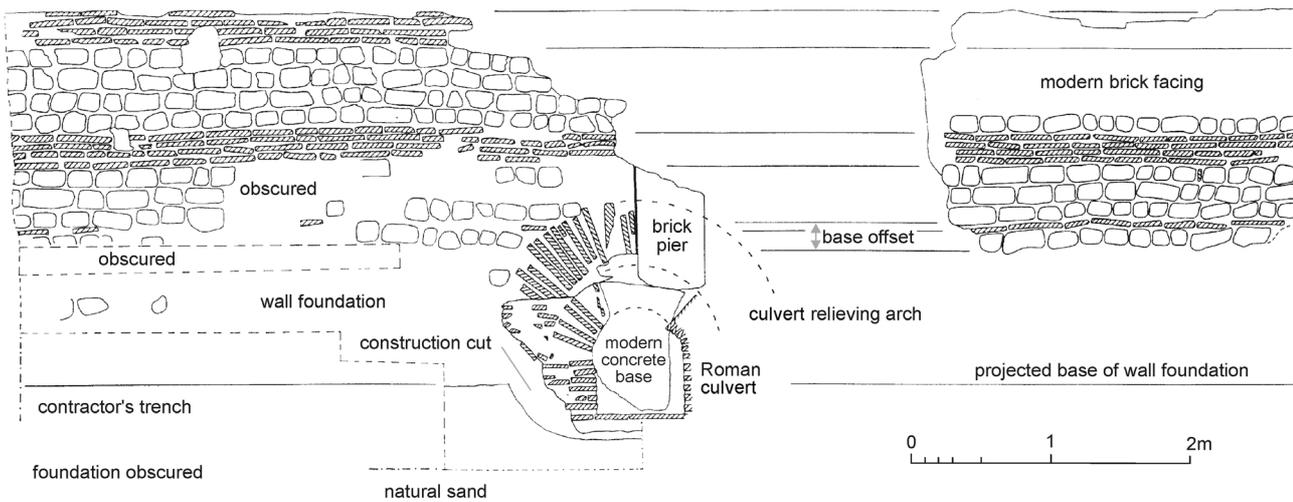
Elevation showing the interior face of the Roman town wall and the Roman culvert.
